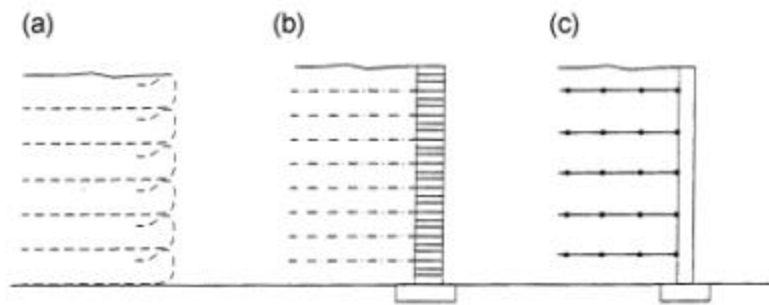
Reinforced retaining wall systems using geosynthetics: (a) with wrap-around geosynthetic facing, (b) with segmental or modular concrete block, and (c) with full-height (propped) precast panels.
